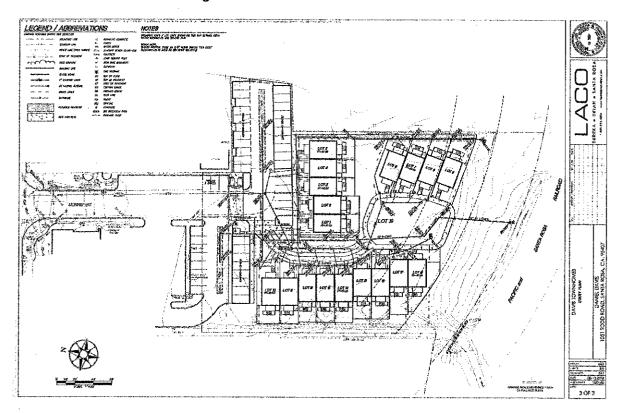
BUILDING AND UTILITY PLAN FOR THE PROPOSED PROJECT
